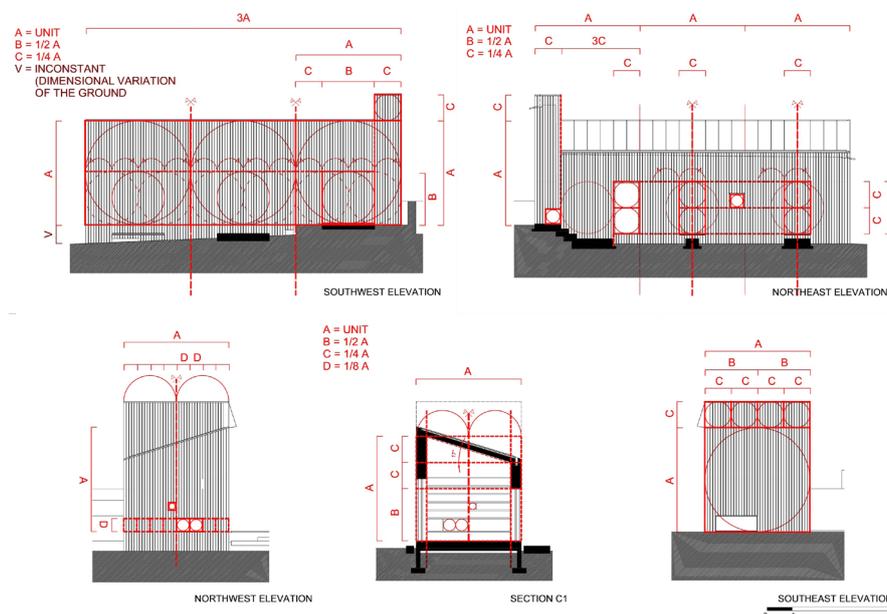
Elevations and section. Metric, symmetries, relation between elements.
